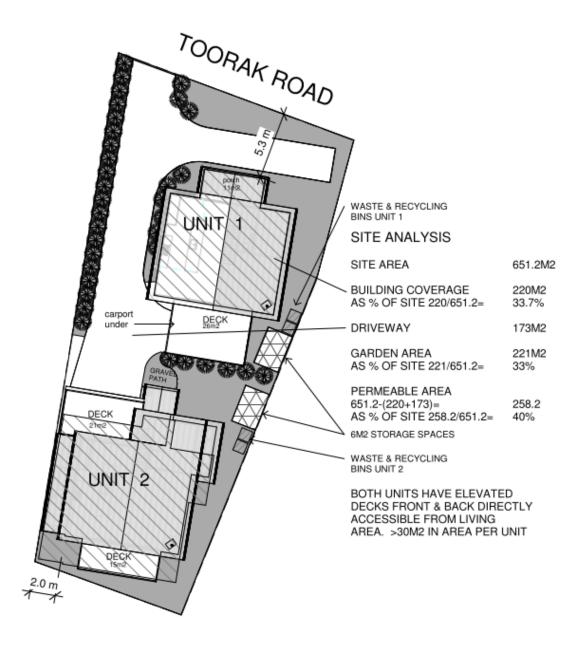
Shows the development layout on site including garden area, site coverage and permeability area figures.
